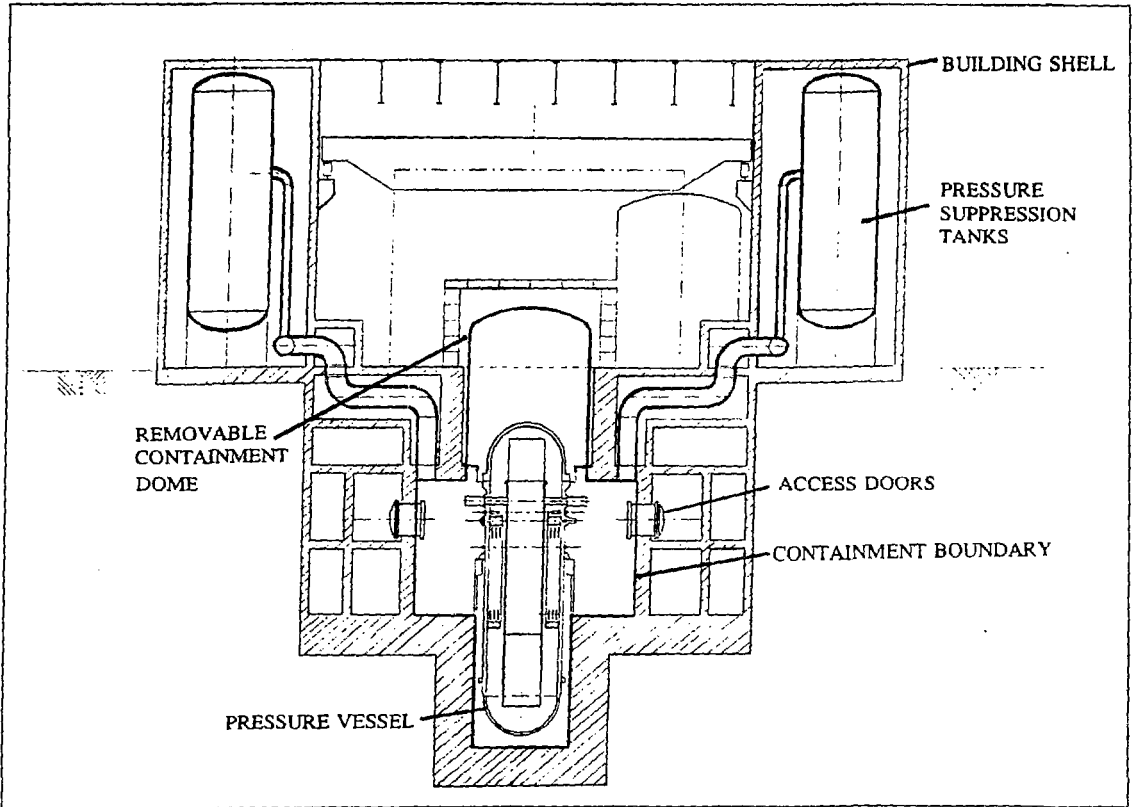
The containment and Reinforced Concrete Structures of SIR
